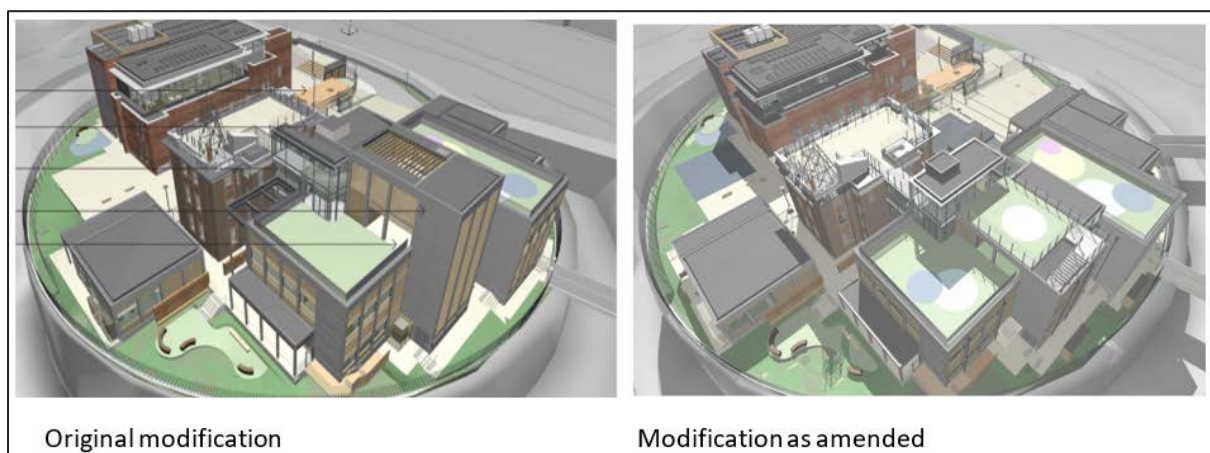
| The site as viewed from the south-west (Source: Modification report and RtS 2021)
